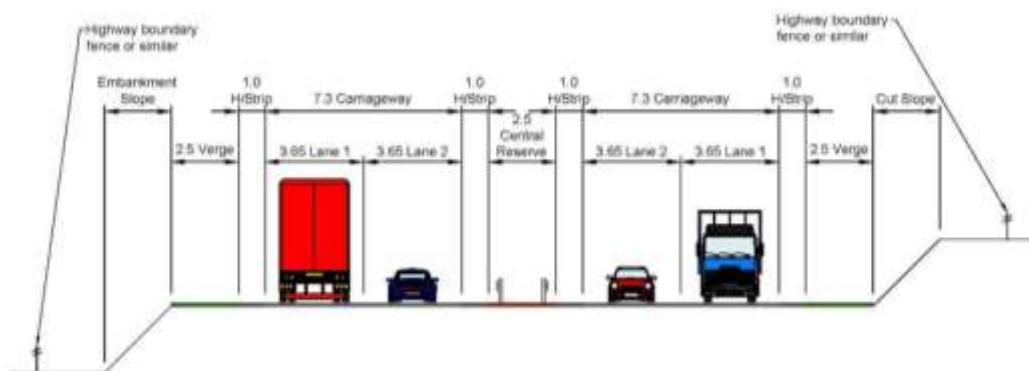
Cross Section Dimensions for a Rural Dual Carriageway. Note: All dimensions in metres.
